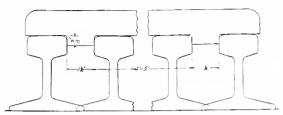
Standard Guard Rail and Frog Wing Gage. Sheet 12.
